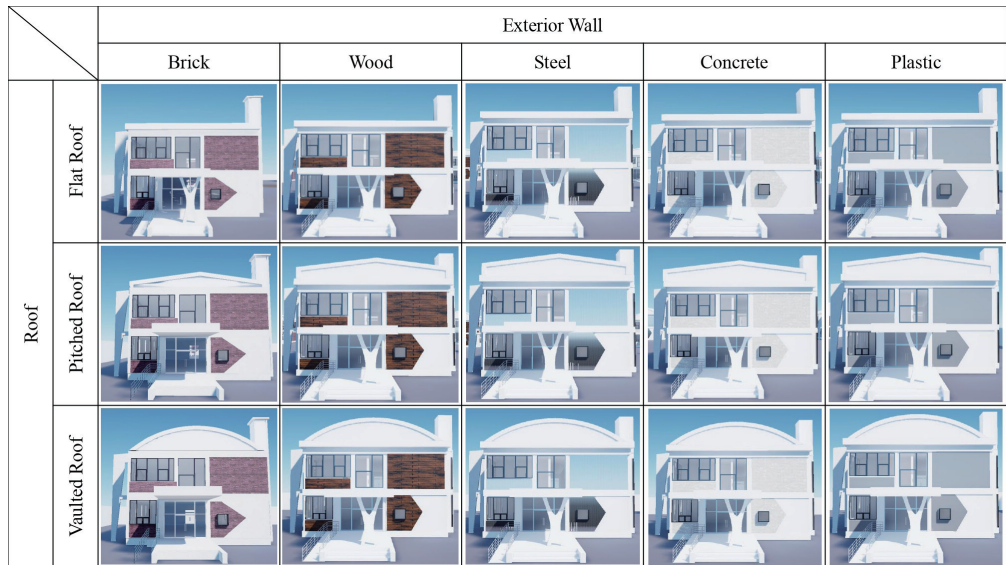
VR Scenes of the Existing System at Test 2 with Roof(3) and External Wall(5) Alternatives
